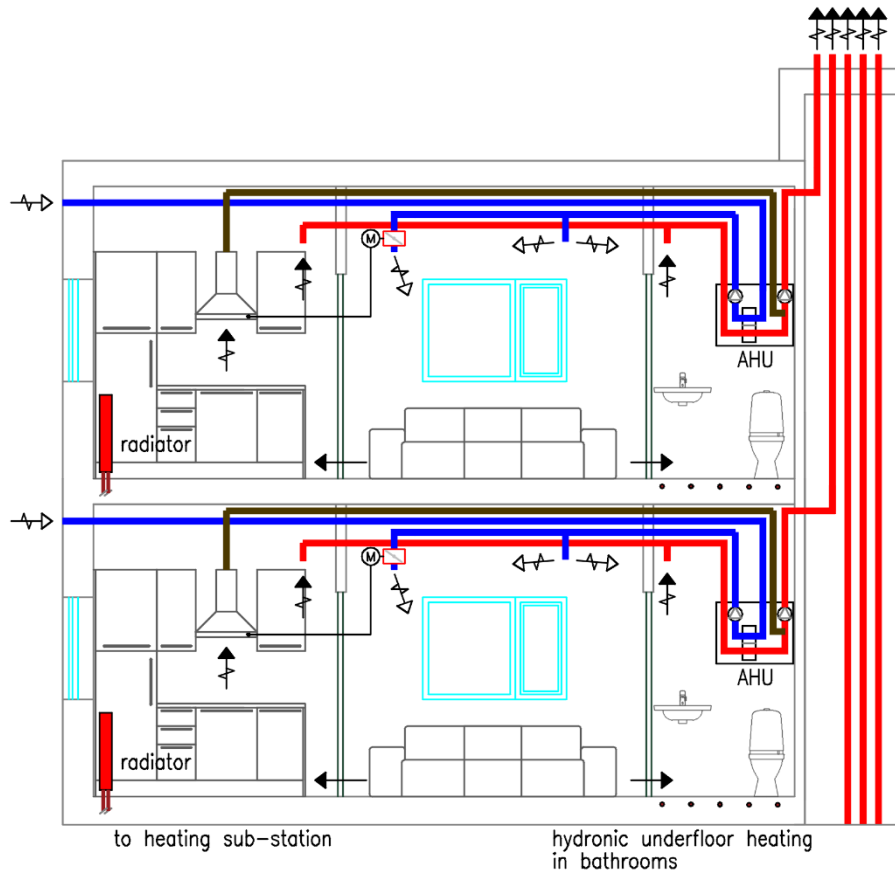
Apartment building mechanical supply-exhaust ventilation with apartment-based air handling units.
